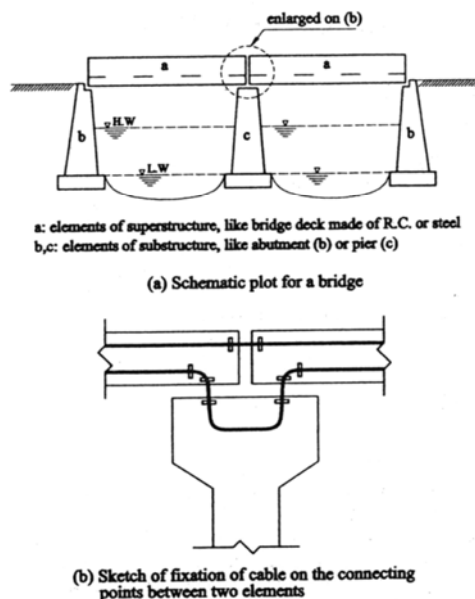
Monitoring System for Relative Movement between Bridge Deck and Deck Joint or Bridge Bearing Point
